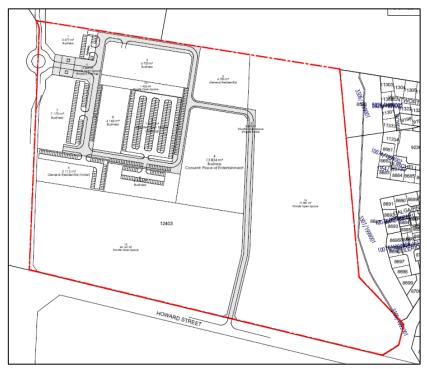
PROPOSED SPECIAL ZONE ERVEN
